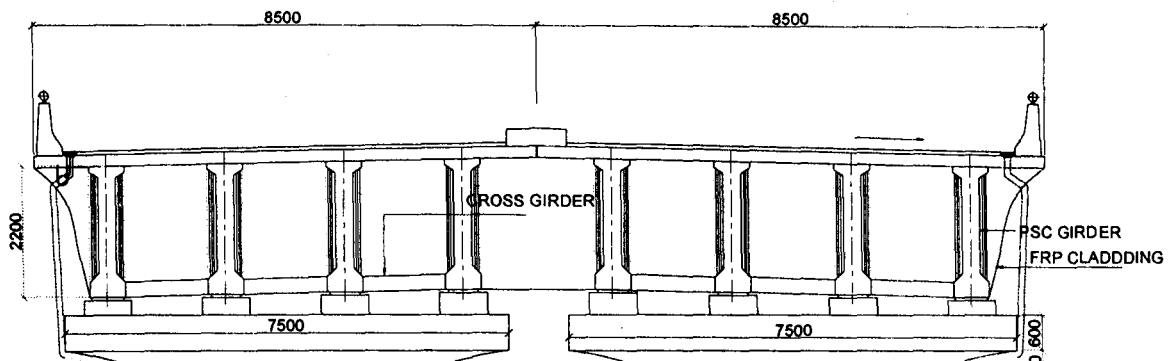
Typical cross section with Post tensioned girders for 4-lane deck
